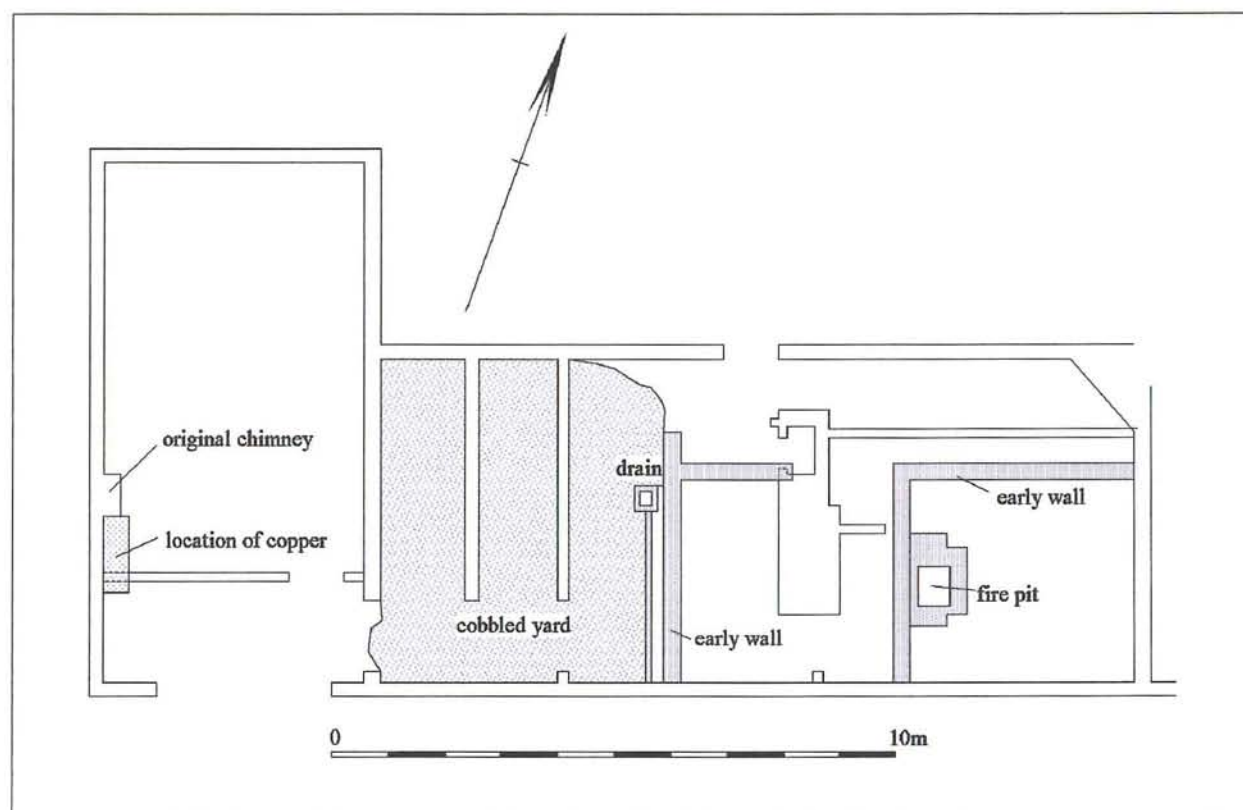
Plan of existing Sixth Form Centre showing evidence for earlier building
